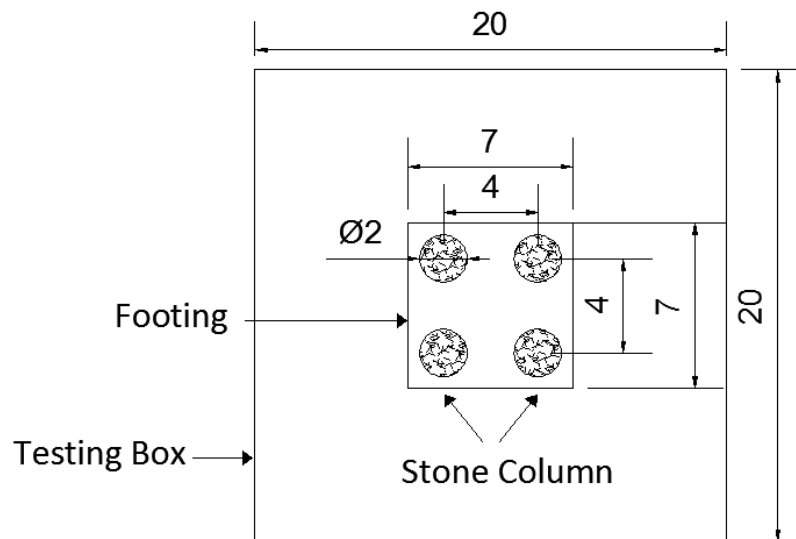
Plan view of the test setup (Dimensions are in cm)
